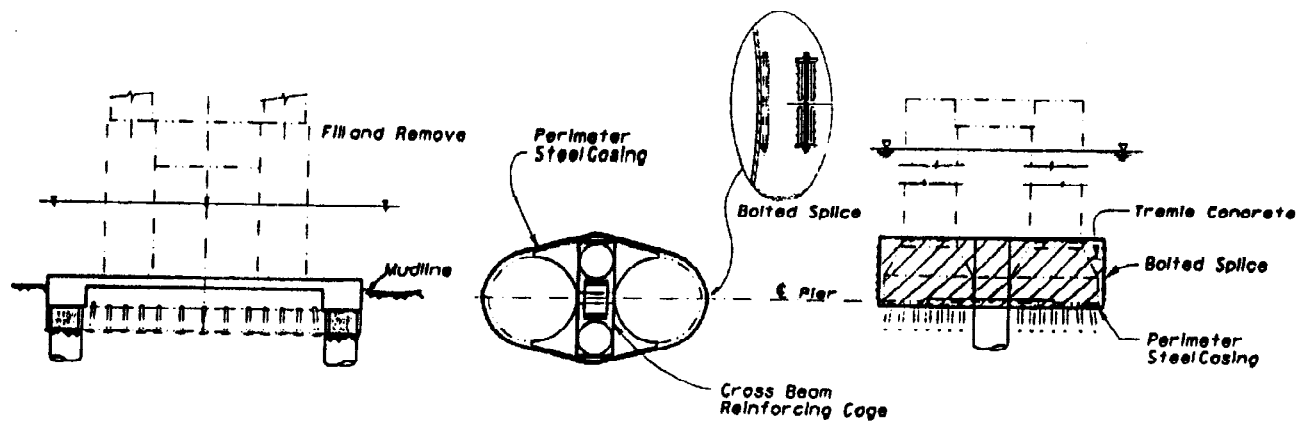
RECTANGULAR FOUNDATION RETROFIT
